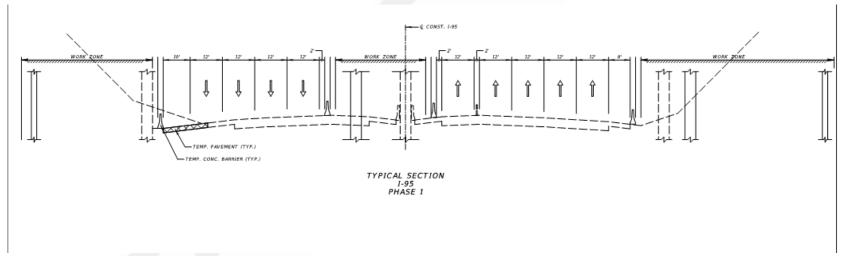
TCP Typical Section I-95 - PHASE 1
